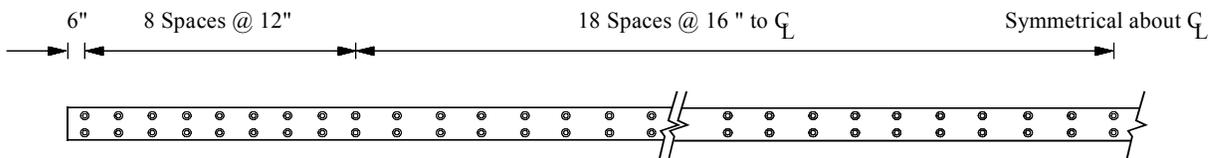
Location of shear studs for PCDT units, single beam shown.
